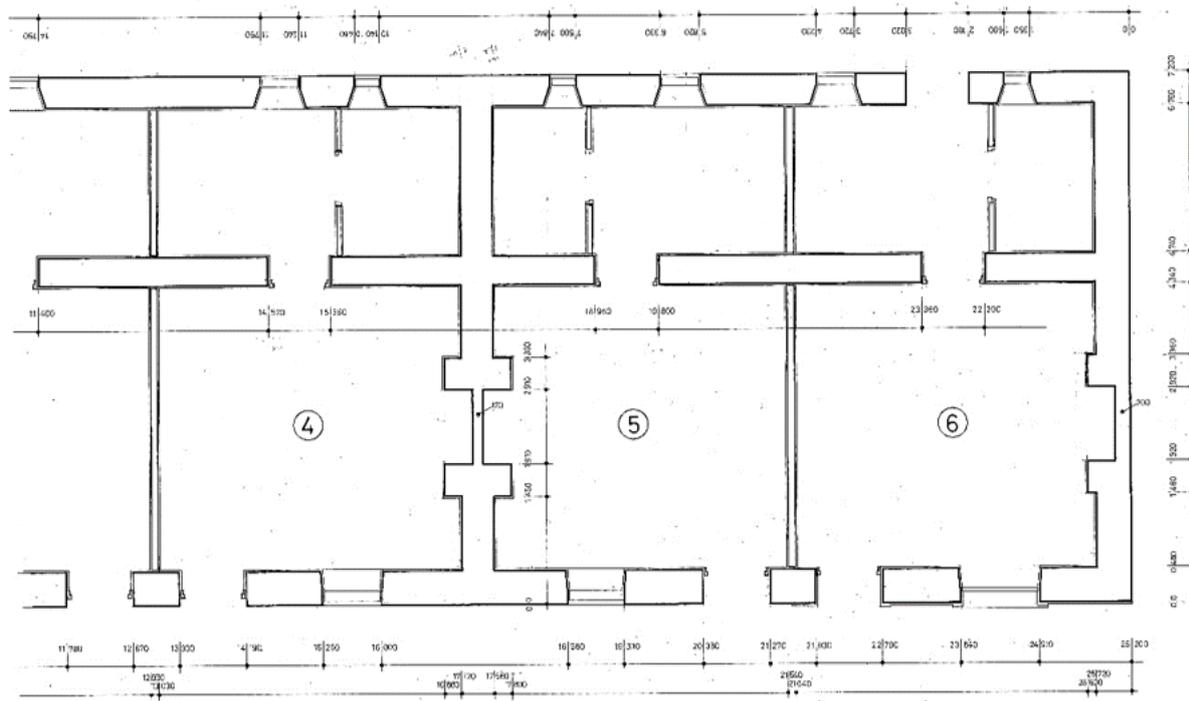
Downstairs plan of Rhyd-Y-Car cottages 4, 5, and 6, plans provided by NMW.
